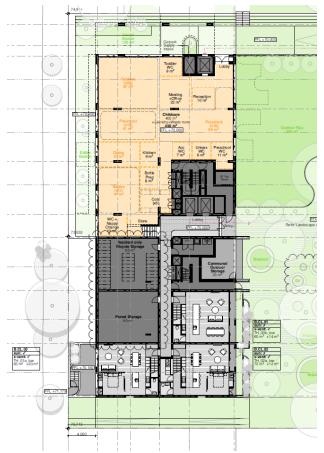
Proposed Floor Plate of the Childcare Centre Level
